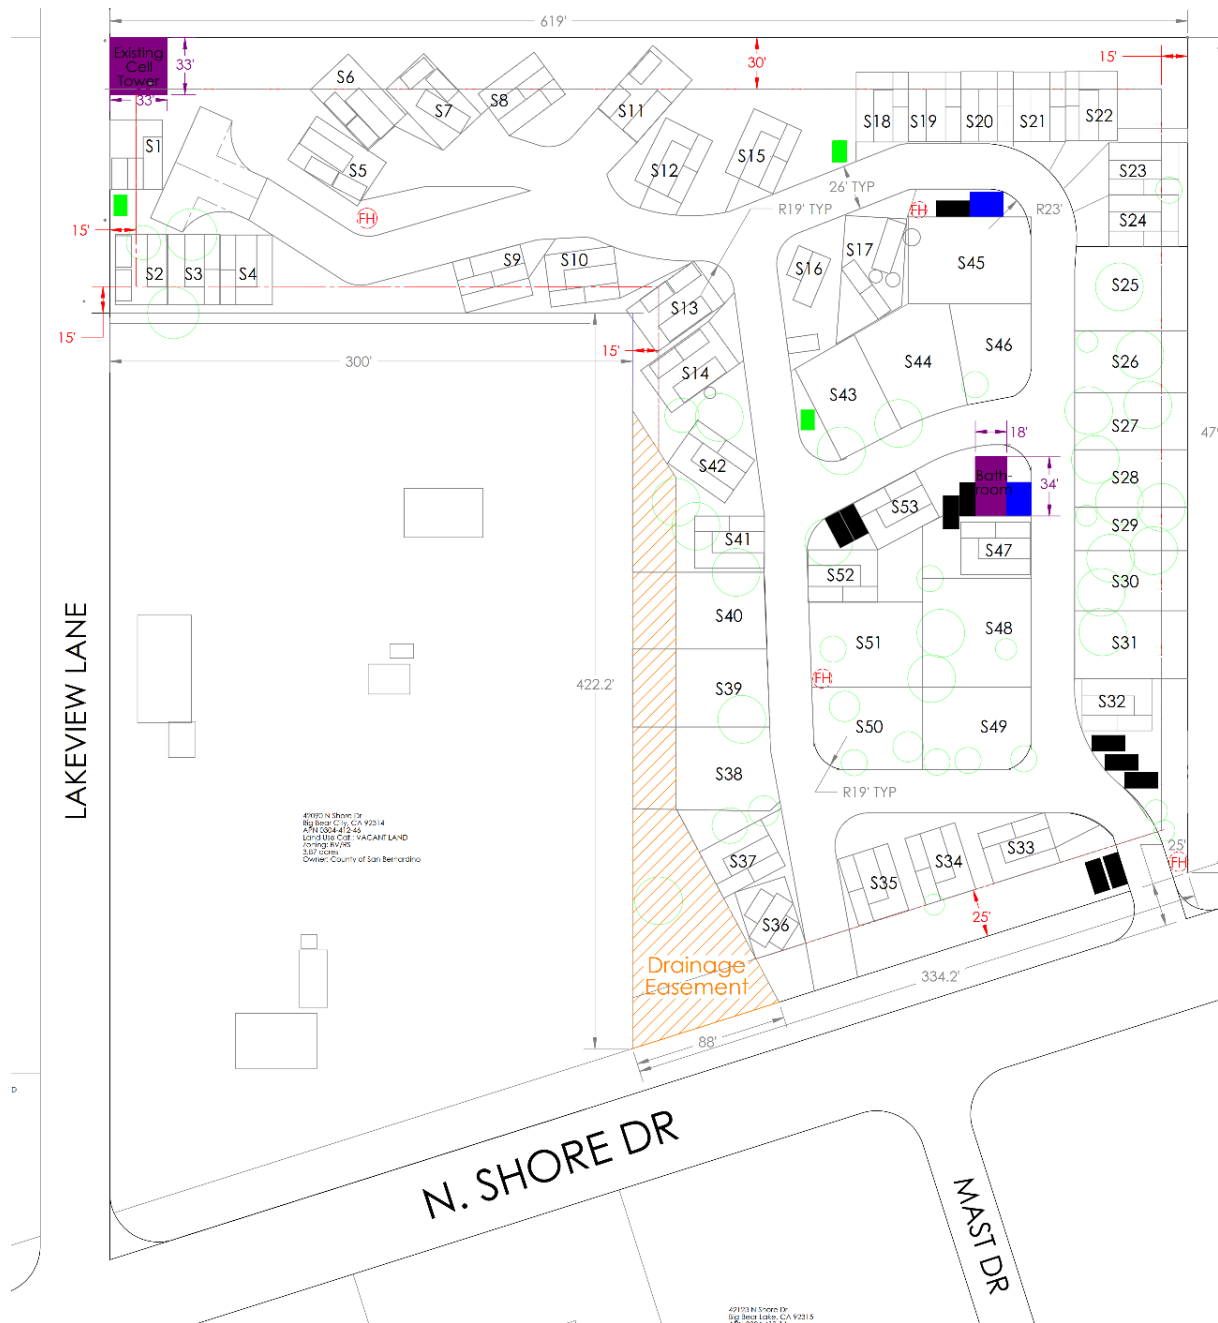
Pine Tree Park Expansion Project Site Plan
